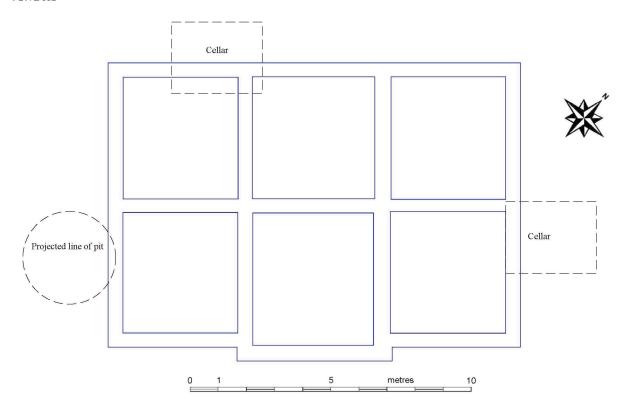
Plan of foundation trenches showing cellars and possible pit (Scale 1:100)
